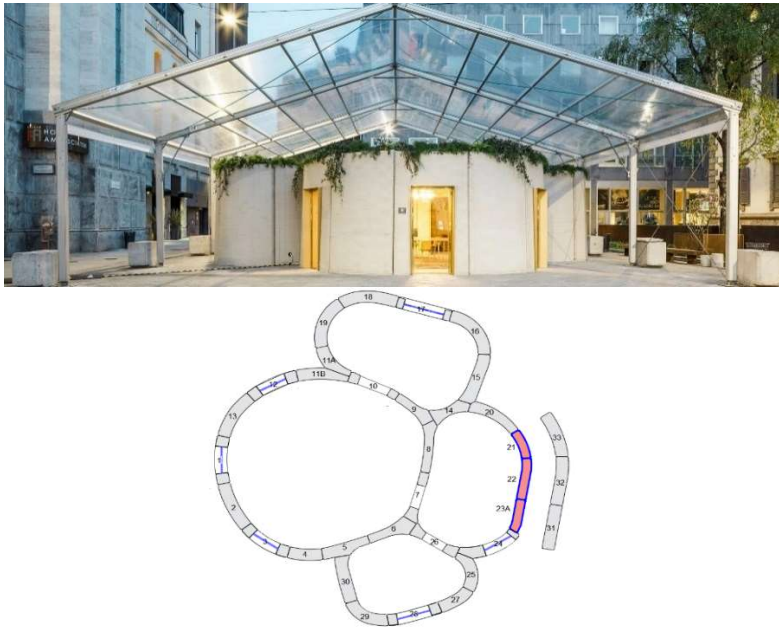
3D printed house in Milan (2018): a) front view and b) plan view with the indication of the three 3D printed walls tested at the University of Brescia.
